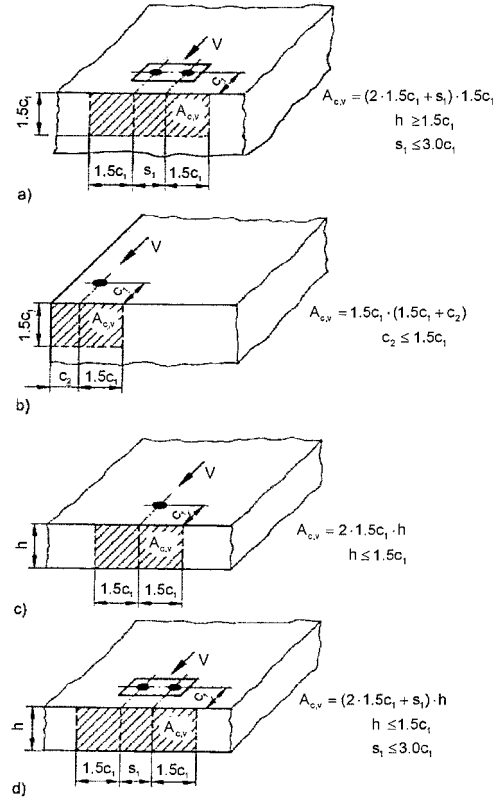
Concrete failure body of a pair of shear-loaded anchors close to an edge (taken from Fuchs, Elgehausen (1986/2))
